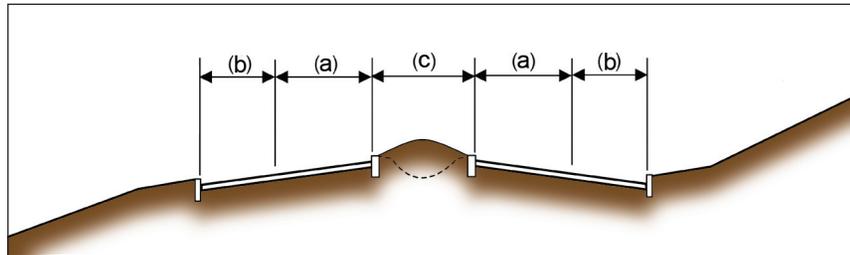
Cross-Section -- Divided Street, Boulevard with Curb
